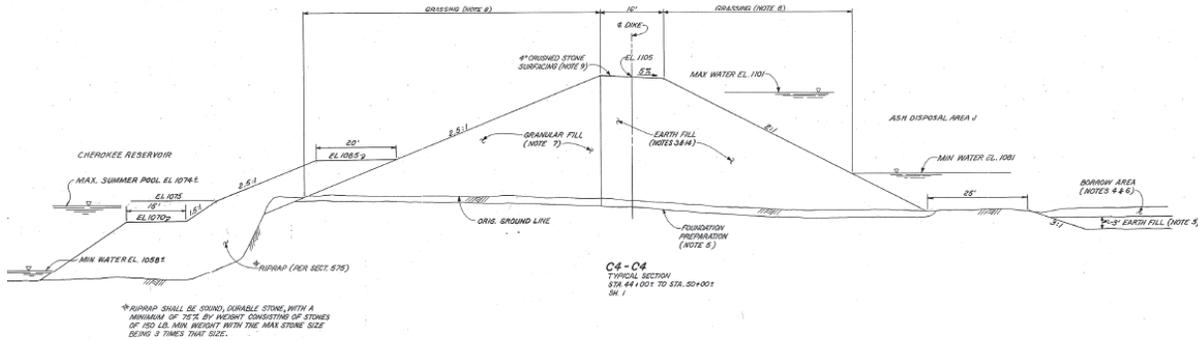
Ash Disposal Area "J" – Typical Section 1984
